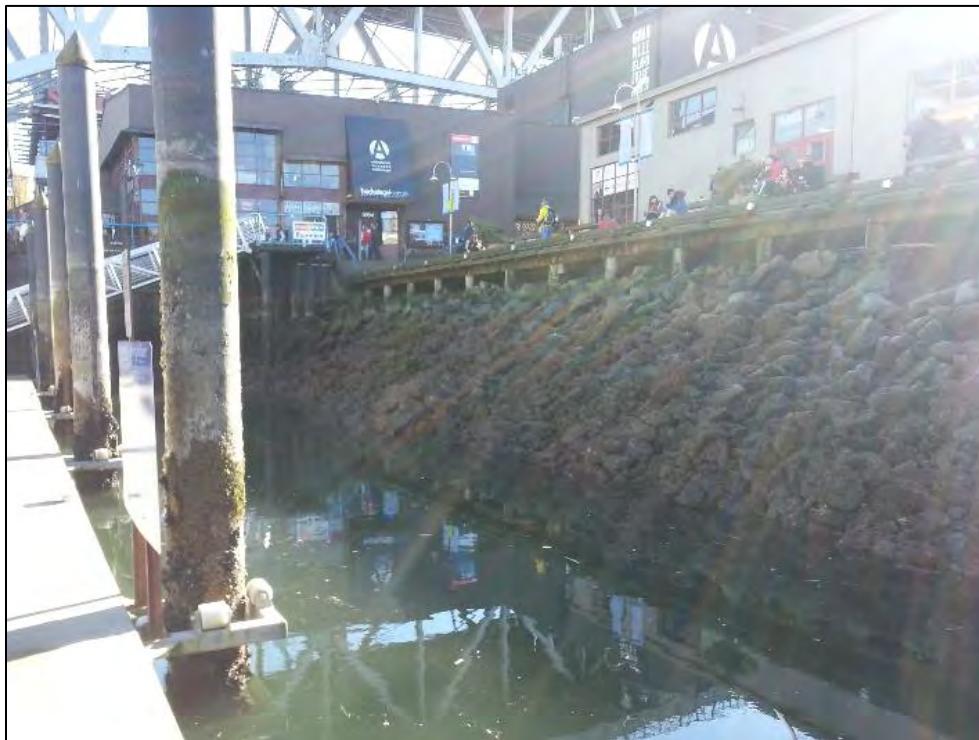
View of the Concrete Pedestals (right side of photo) to be Replaced adjacent to the Public Market Boardwalk
